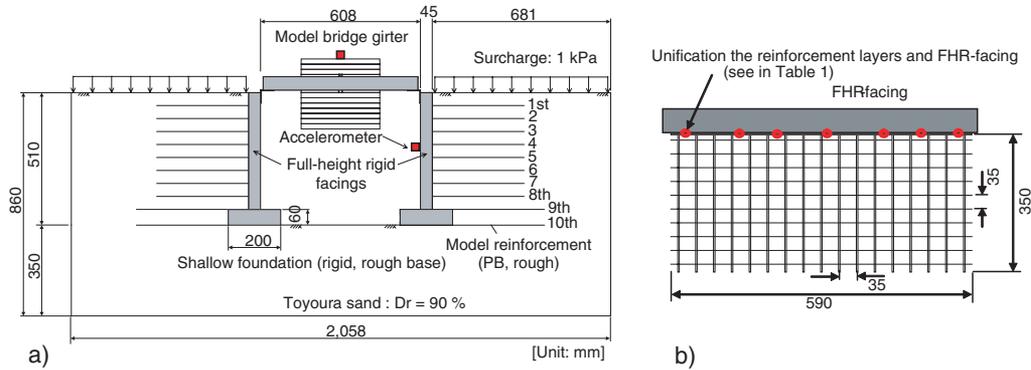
a) Cross-section of GRS-integral bridge model (Test 3 & 4), and b) plan of model reinforcement layer.
